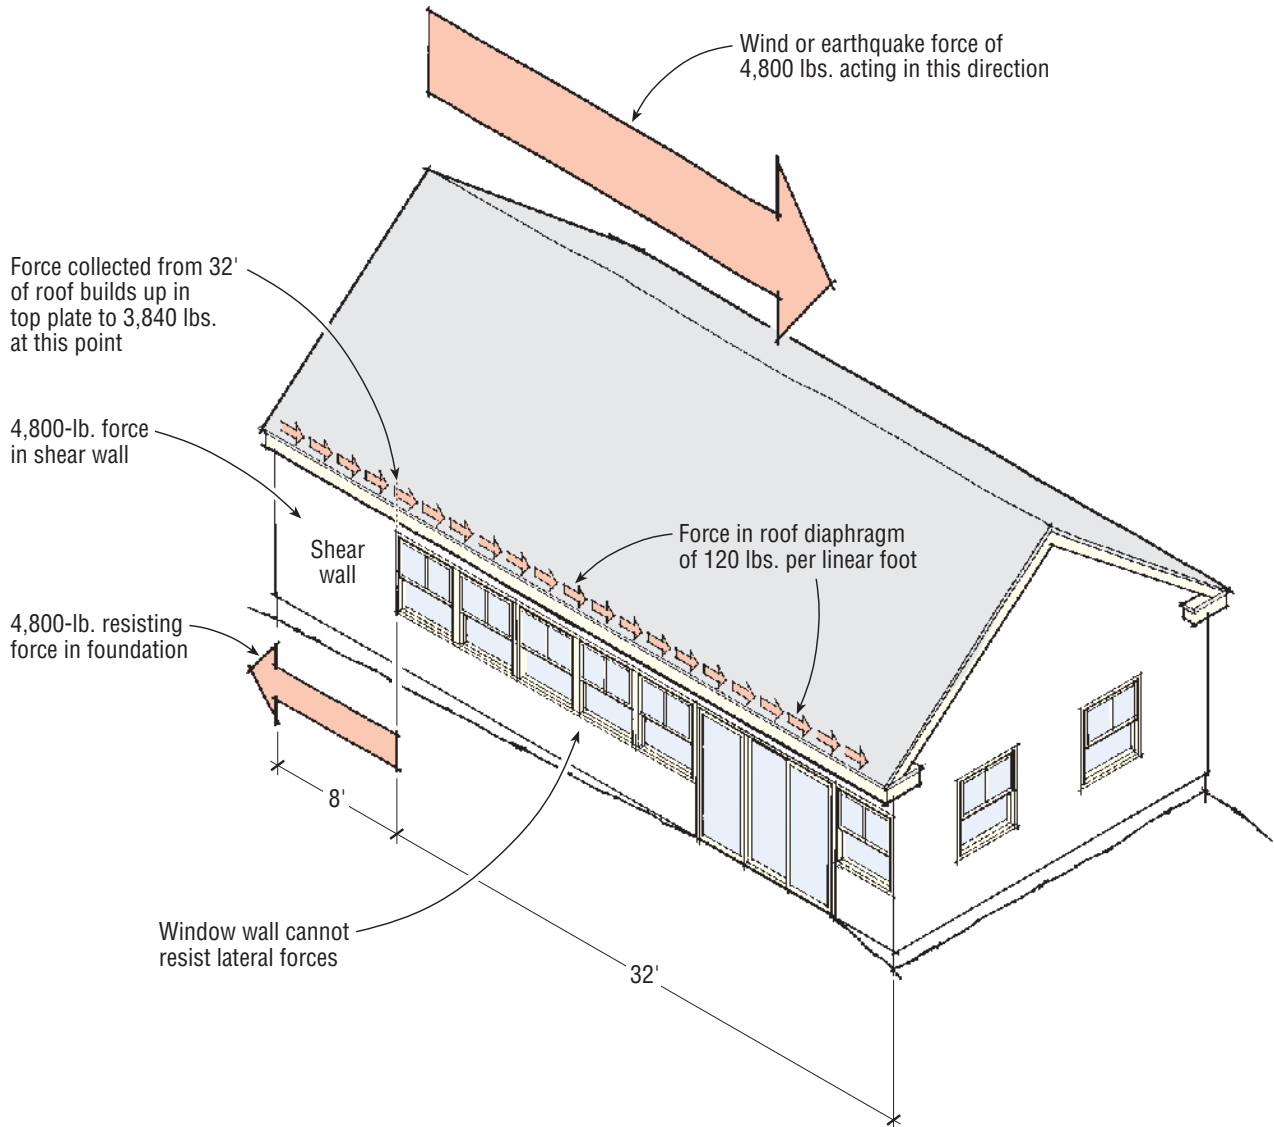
The top plate above the windows in the front wall of this house must be able to collect the cumulative lateral force from the roof diaphragm — 120 pounds per foot in this example — and deliver it to the shear wall at the left end of the building. An ordinary double top plate, as commonly built, would not be up to the task.
